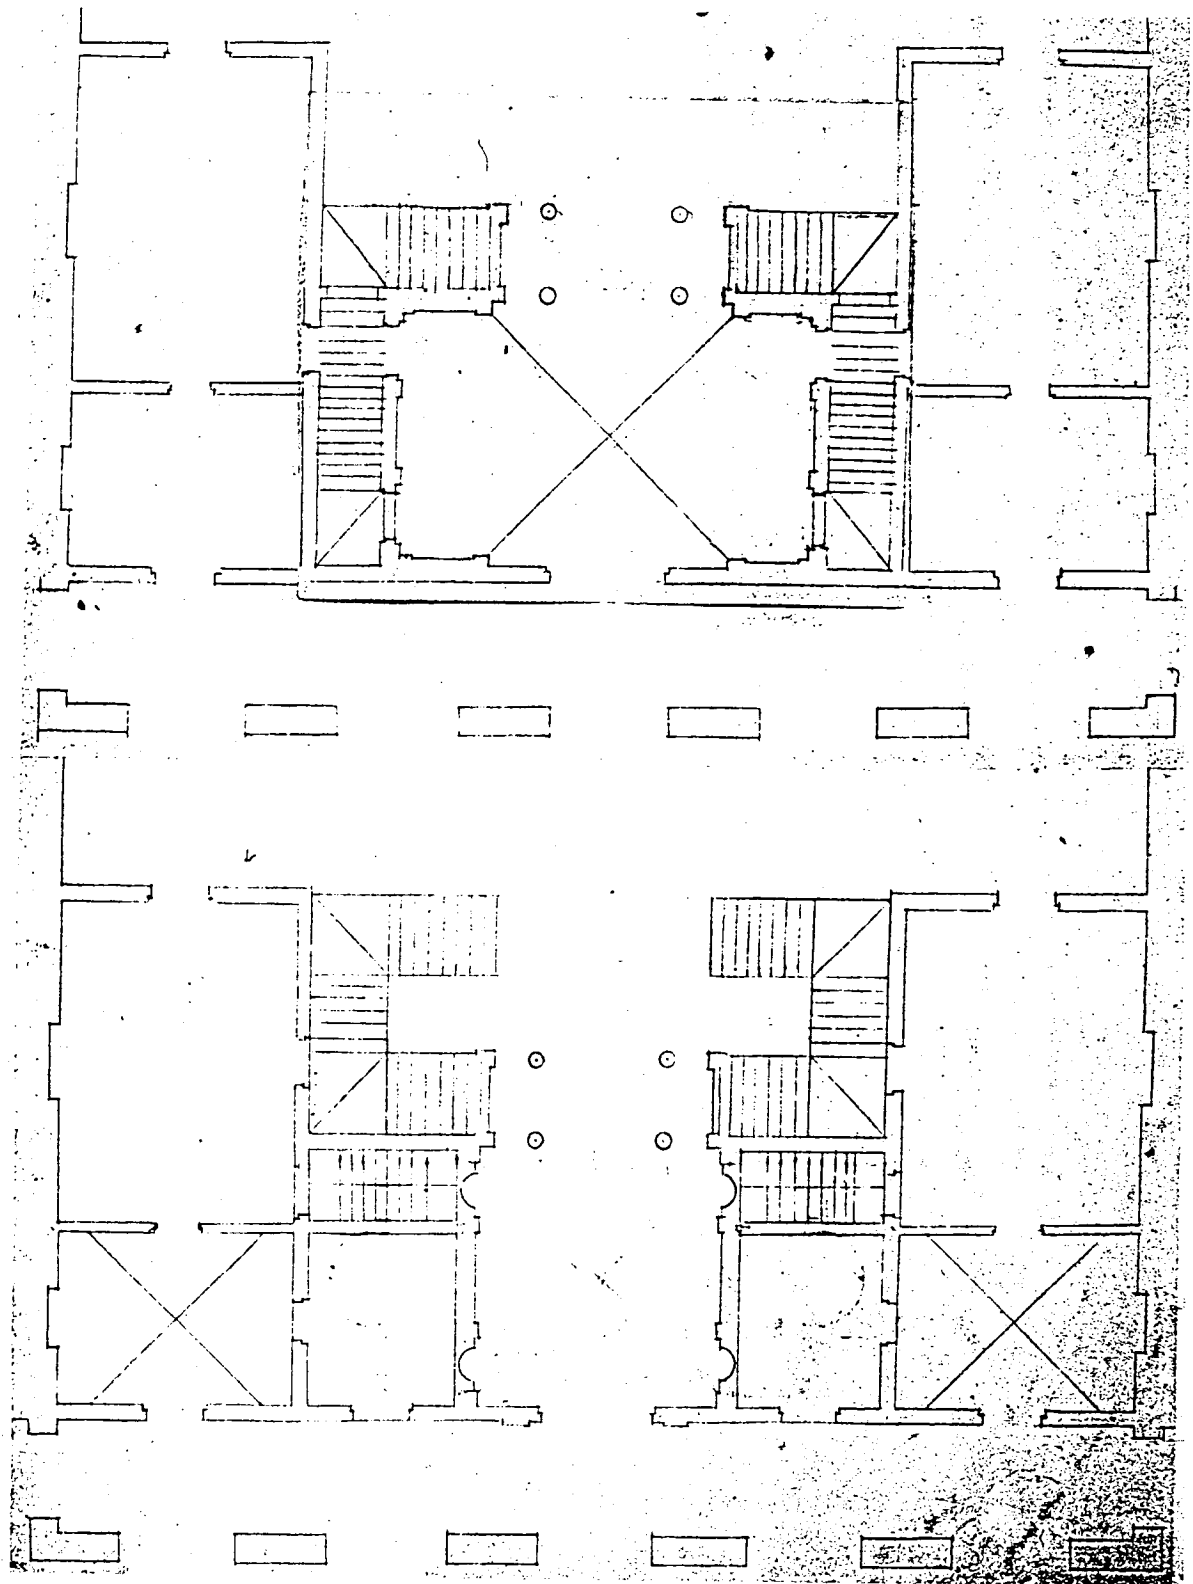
Andrea Palladio: plans for Palazzo Civena (RIBA XVI/11)
